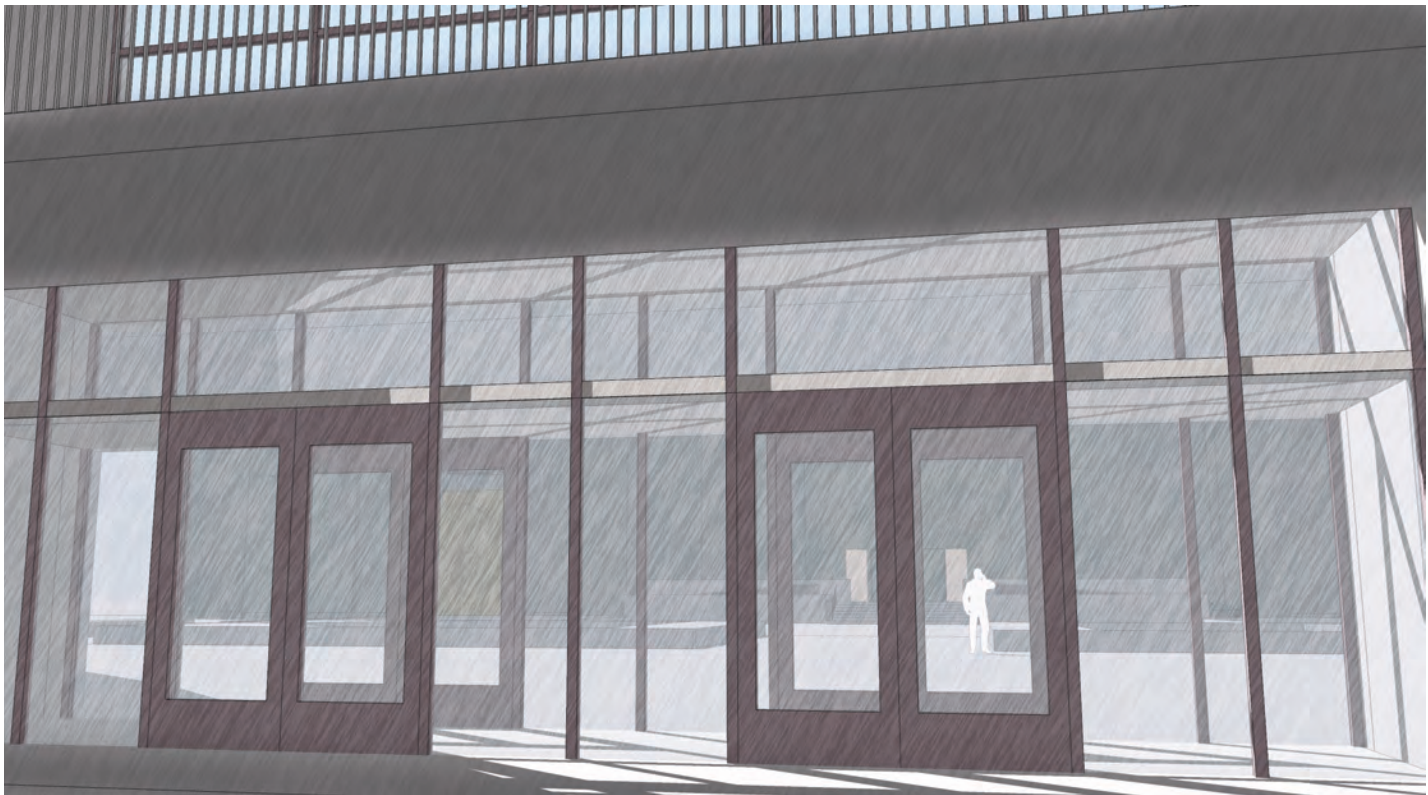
Perspective 3 - Existing Herschler Building - Interior Vestibule Looking South at Capitol Building
